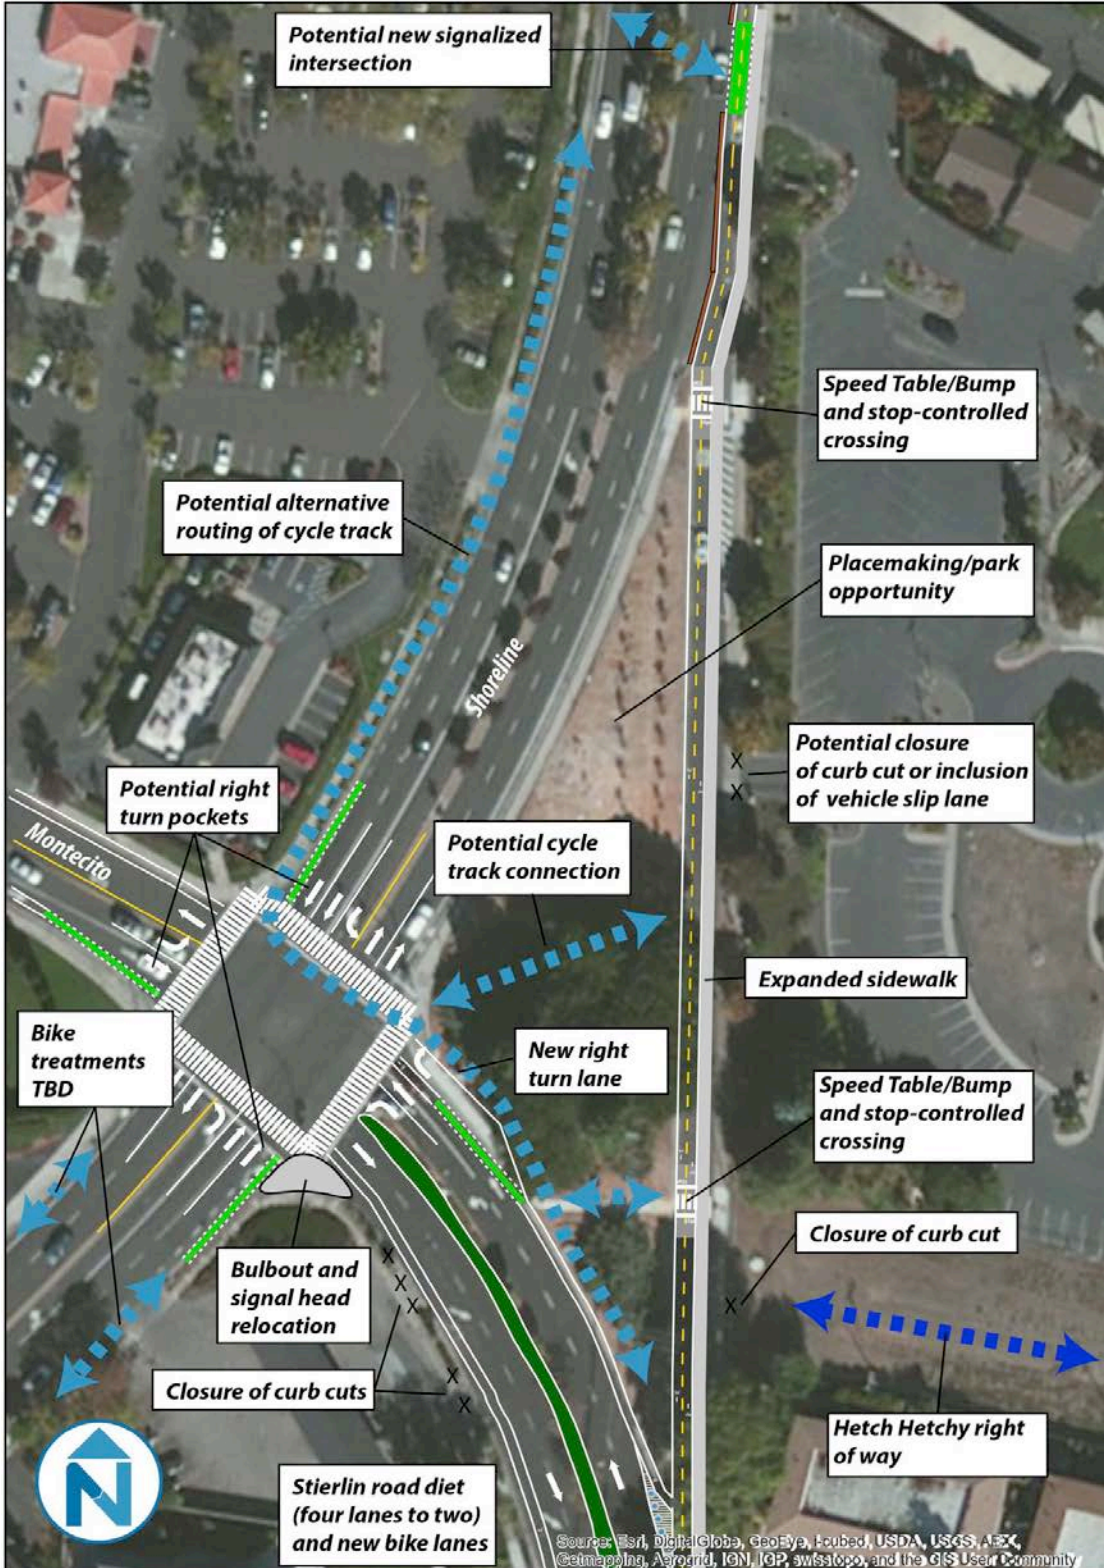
Stierlin Road/Montecito Avenue/Shoreline Boulevard Intersection Improvements
